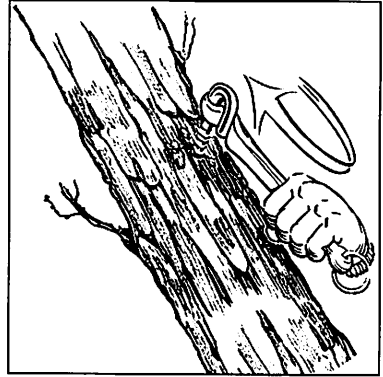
Cable aid used to turn lag hooks and attach dead-end grips.
